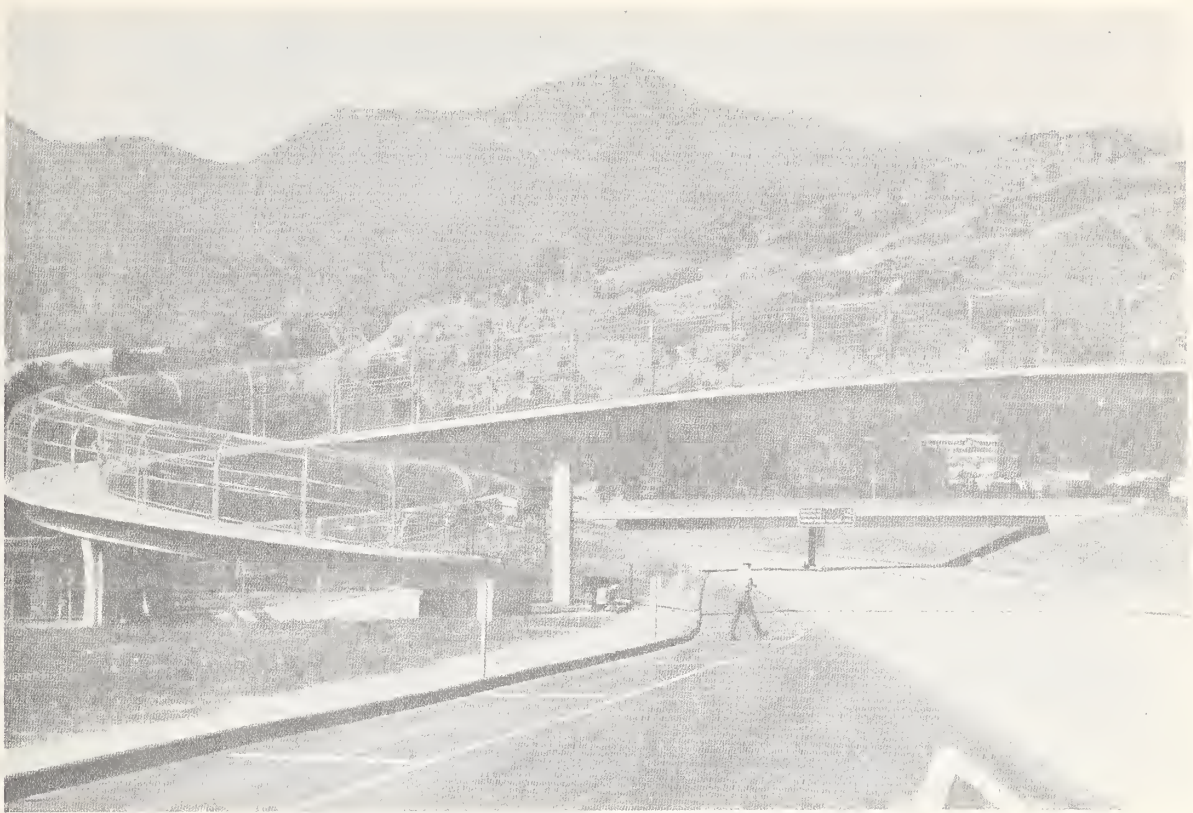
Tyler Street Pedestrian Overcrossing at
